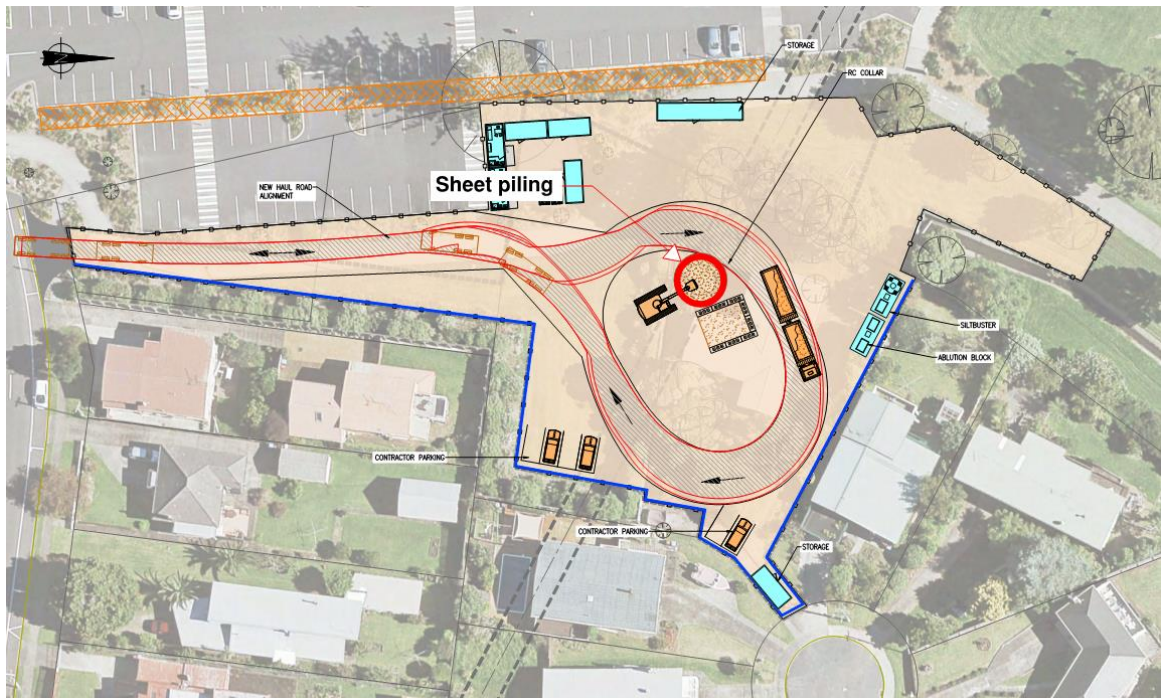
Sheet Piling Locations – Bifurcation and Control Chamber (sheet piling location shown in red)
